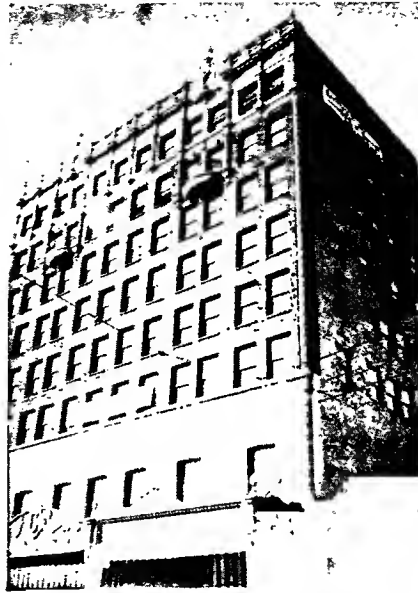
A tall, well-constructed, steel-frame building practically unaffected by the Santa Barbara, California, earthquake of 1925.
